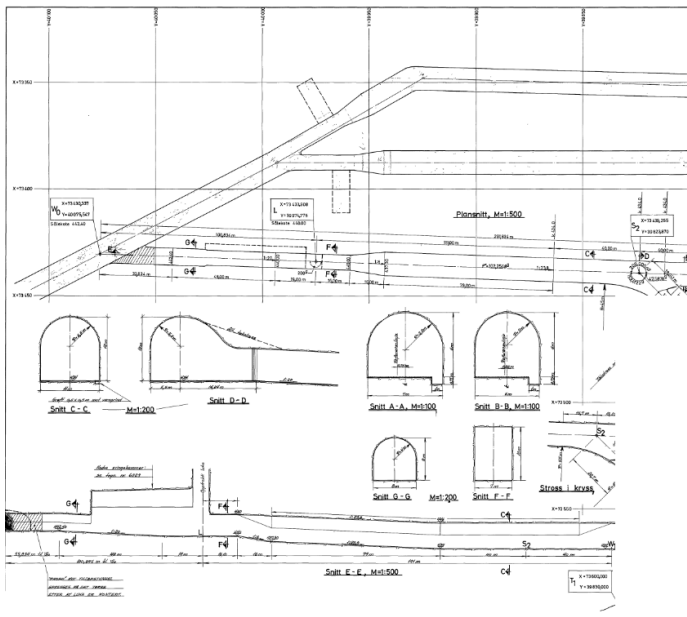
Engineering drawing of the Tonstad power plant sand trap. Parts of the drawing has been removed, by Sira-Kvina's request.[Ref: Sira-Kvina kraftselskap, (2020)]
